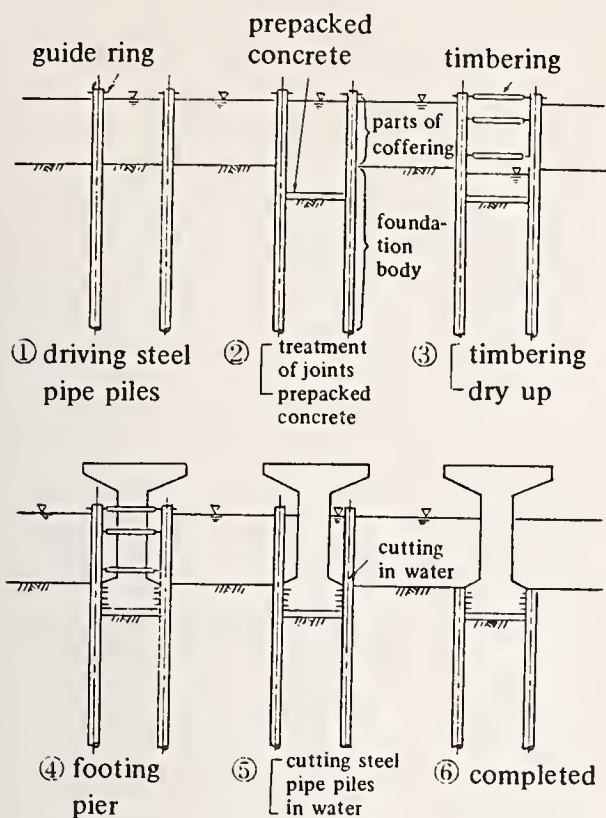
several steps in construction of the "cofferdam" type of the sheet pile foundations
